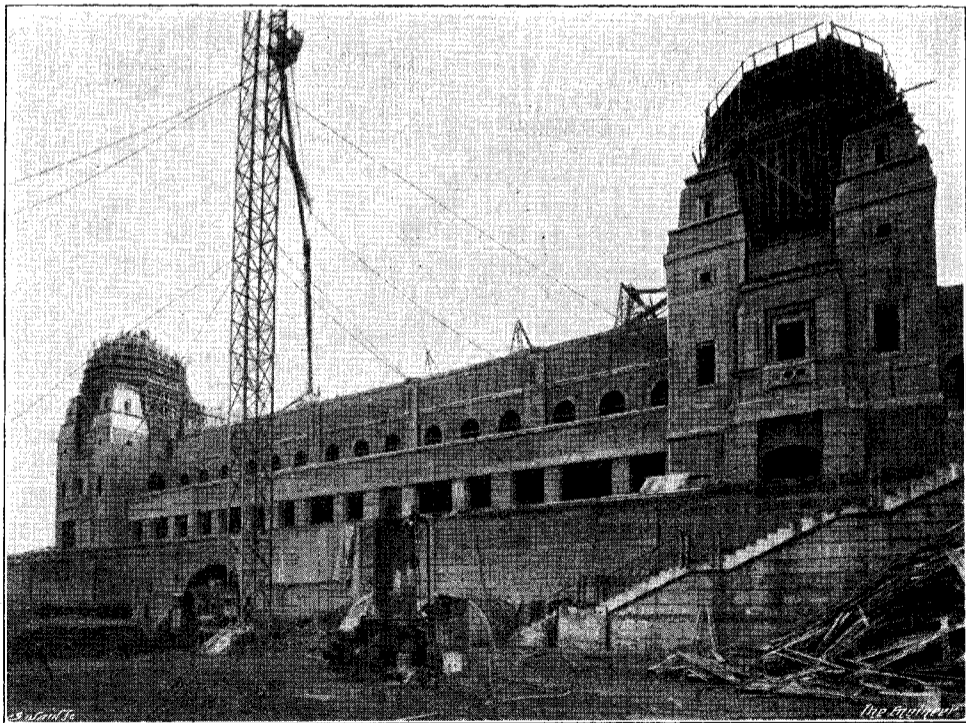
BUILDING ON NORTH FRONT UNDER CONSTRUCTION
